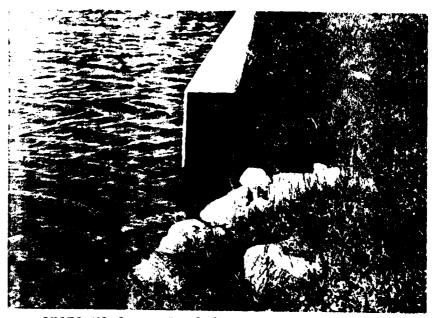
Eroded area on upstream face at right end of spillway wingwall.
